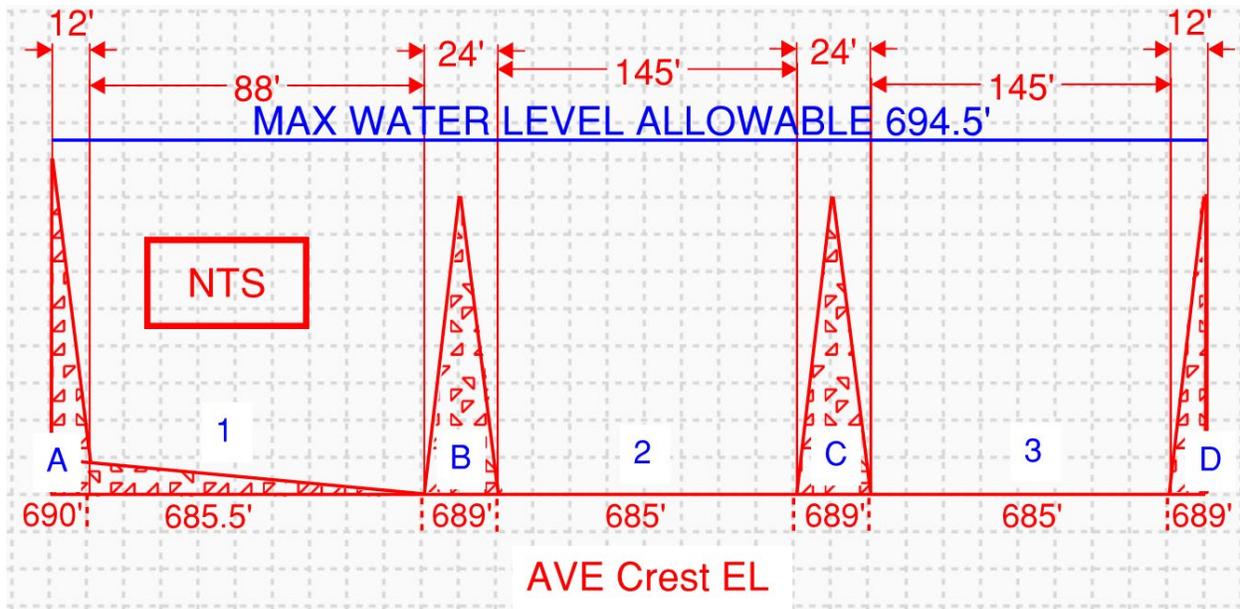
Section view of deflated rubber dam at maximum allowable water level
